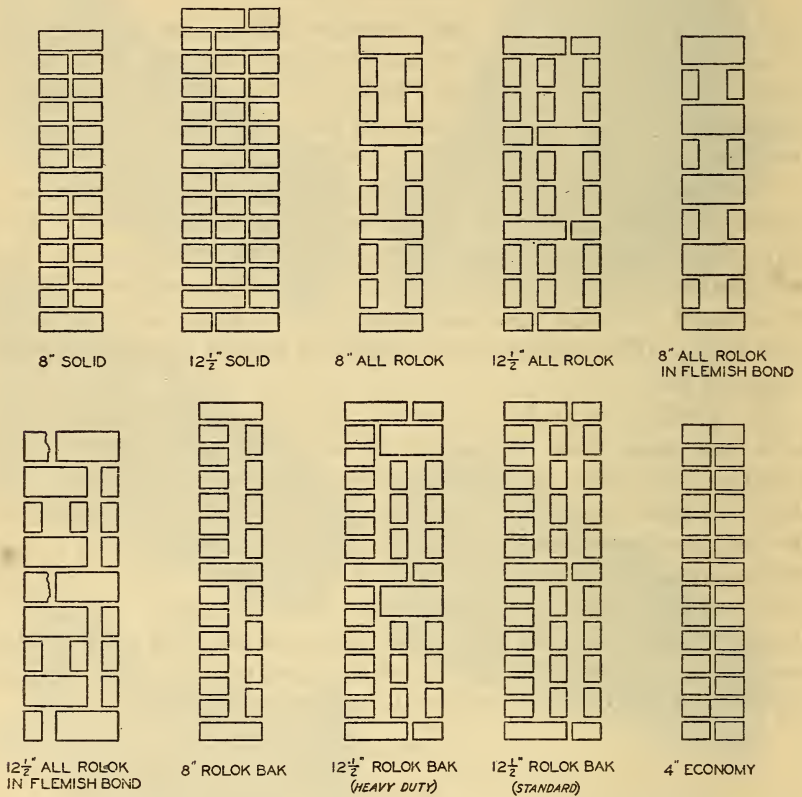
Sectional views of the types of brick-wall construction tested
